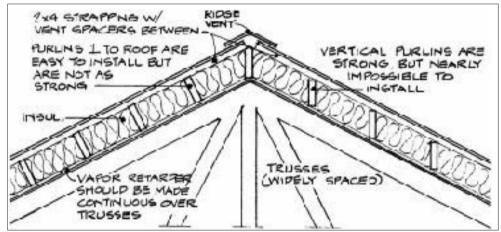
Setting purlins perpendicular to the roof plane makes for easy construction, but they are not as strong as purlins set vertically.
